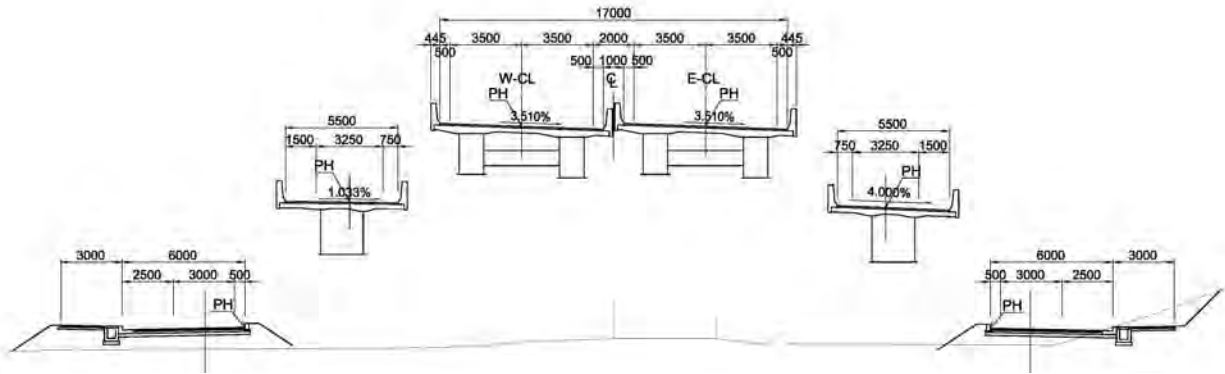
(3) Typical Cross Section of ON-OFF Ramp Section
